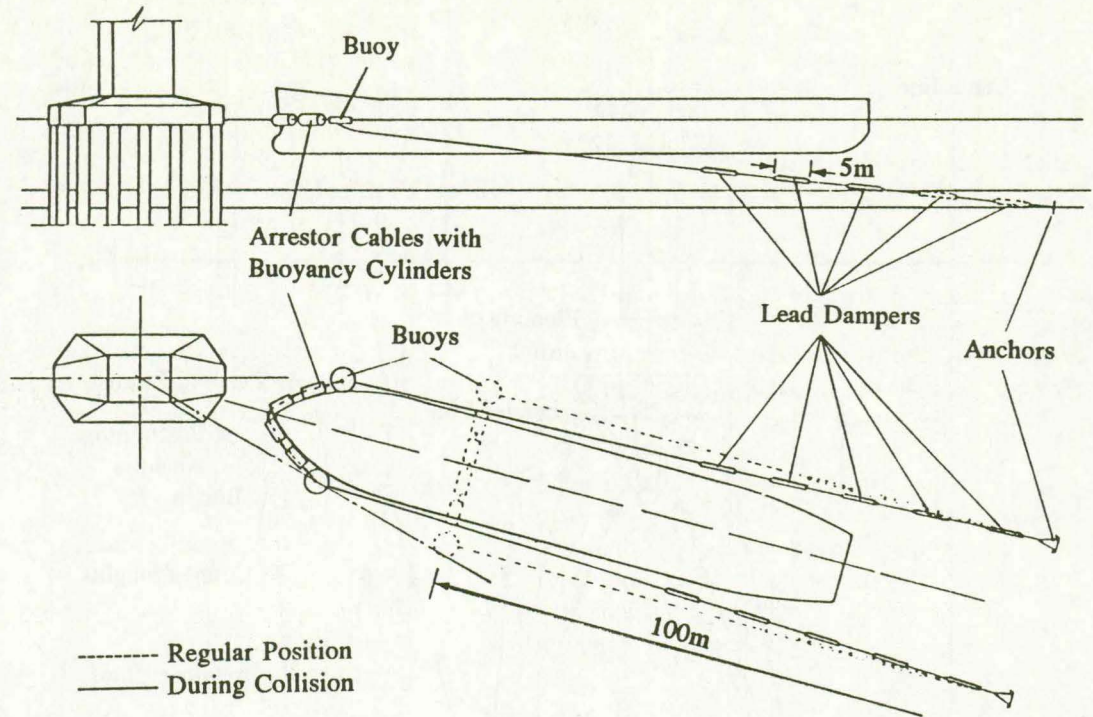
Cable System Protecting Piers of the Taranto Bridge Across the Mare Piccolo, Italy [18]. (All Units are Metric)
